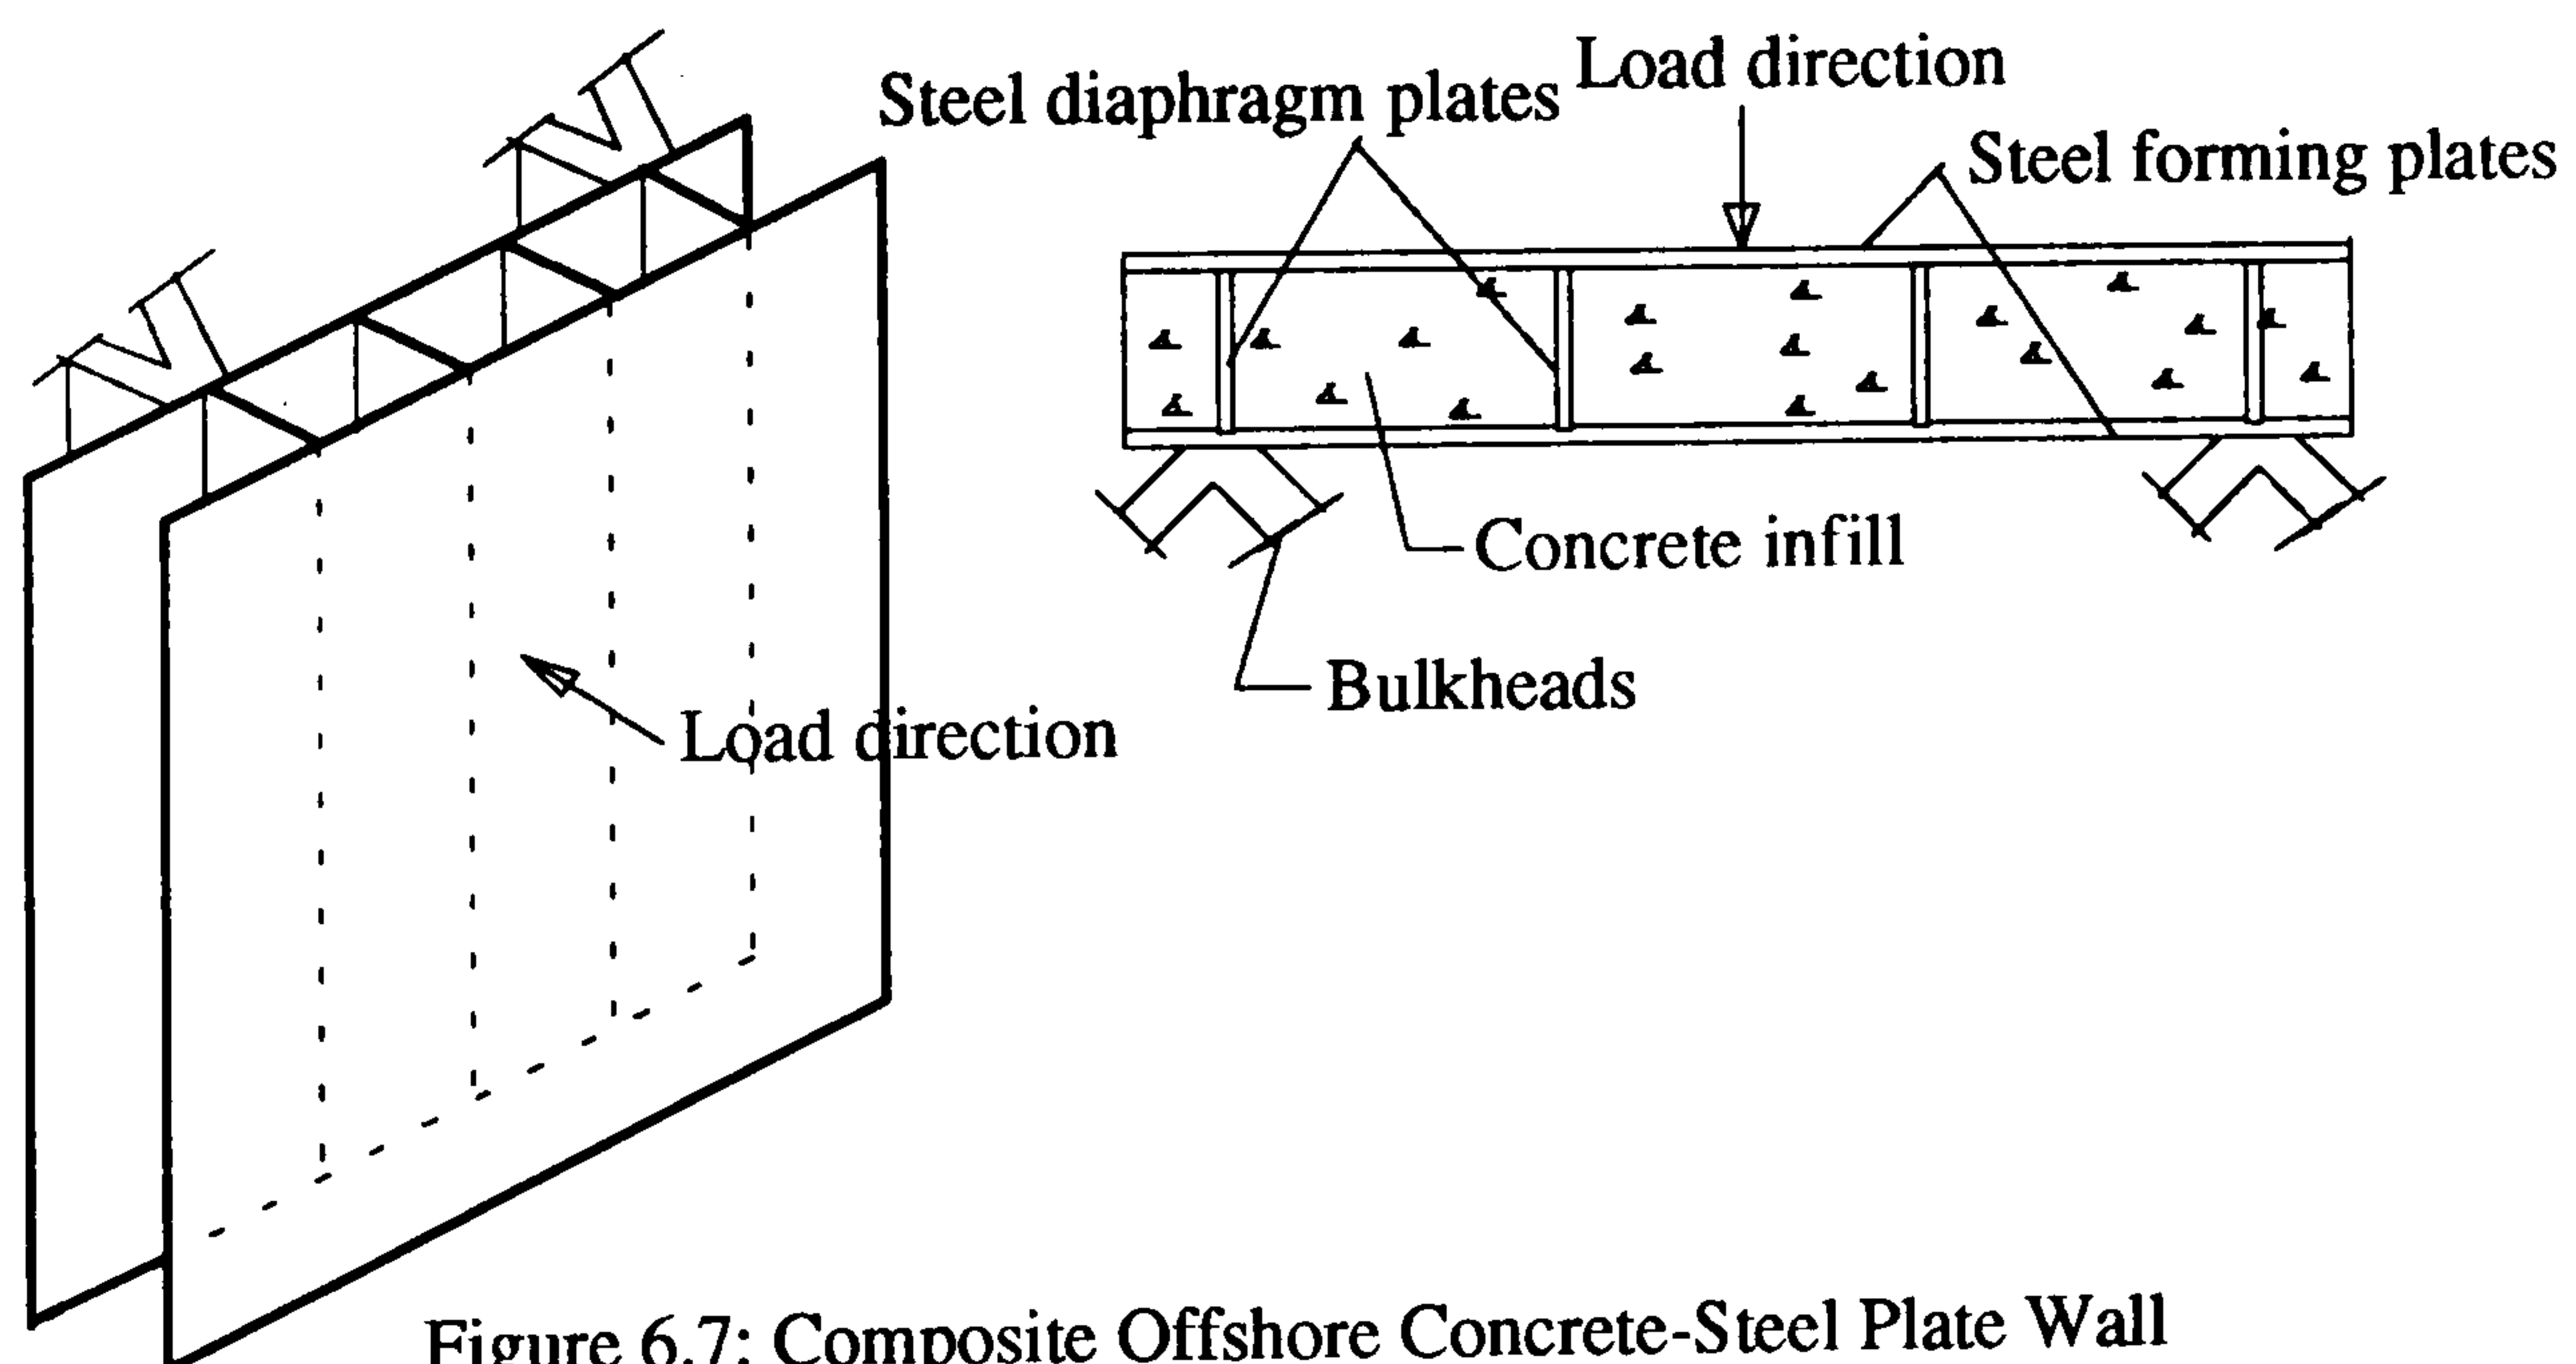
Composite Offshore Concrete-Steel Plate Wall
